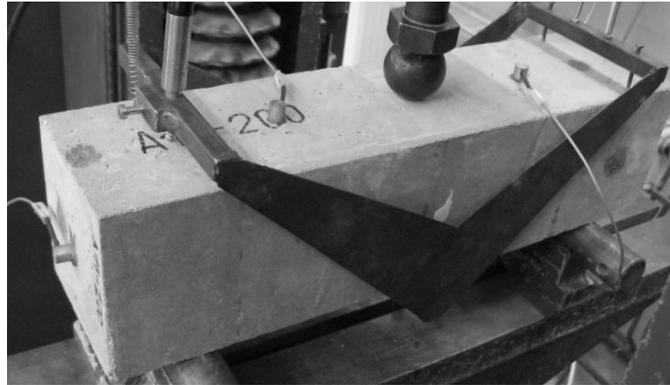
The arrangement of acoustic emission sensors on specimen during the three-point bending test.
